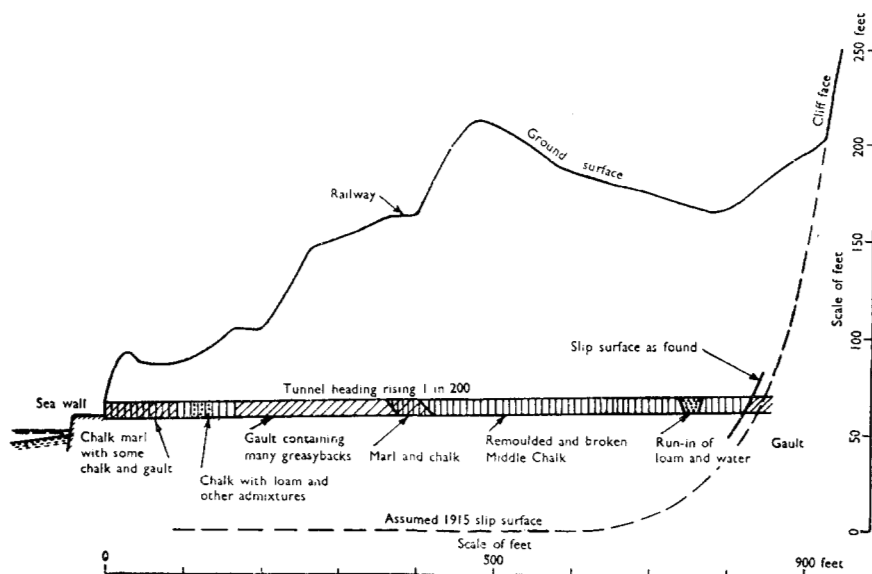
DISTORTED SECTION ON LINE OF CIRCULAR TUNNEL HEADING
